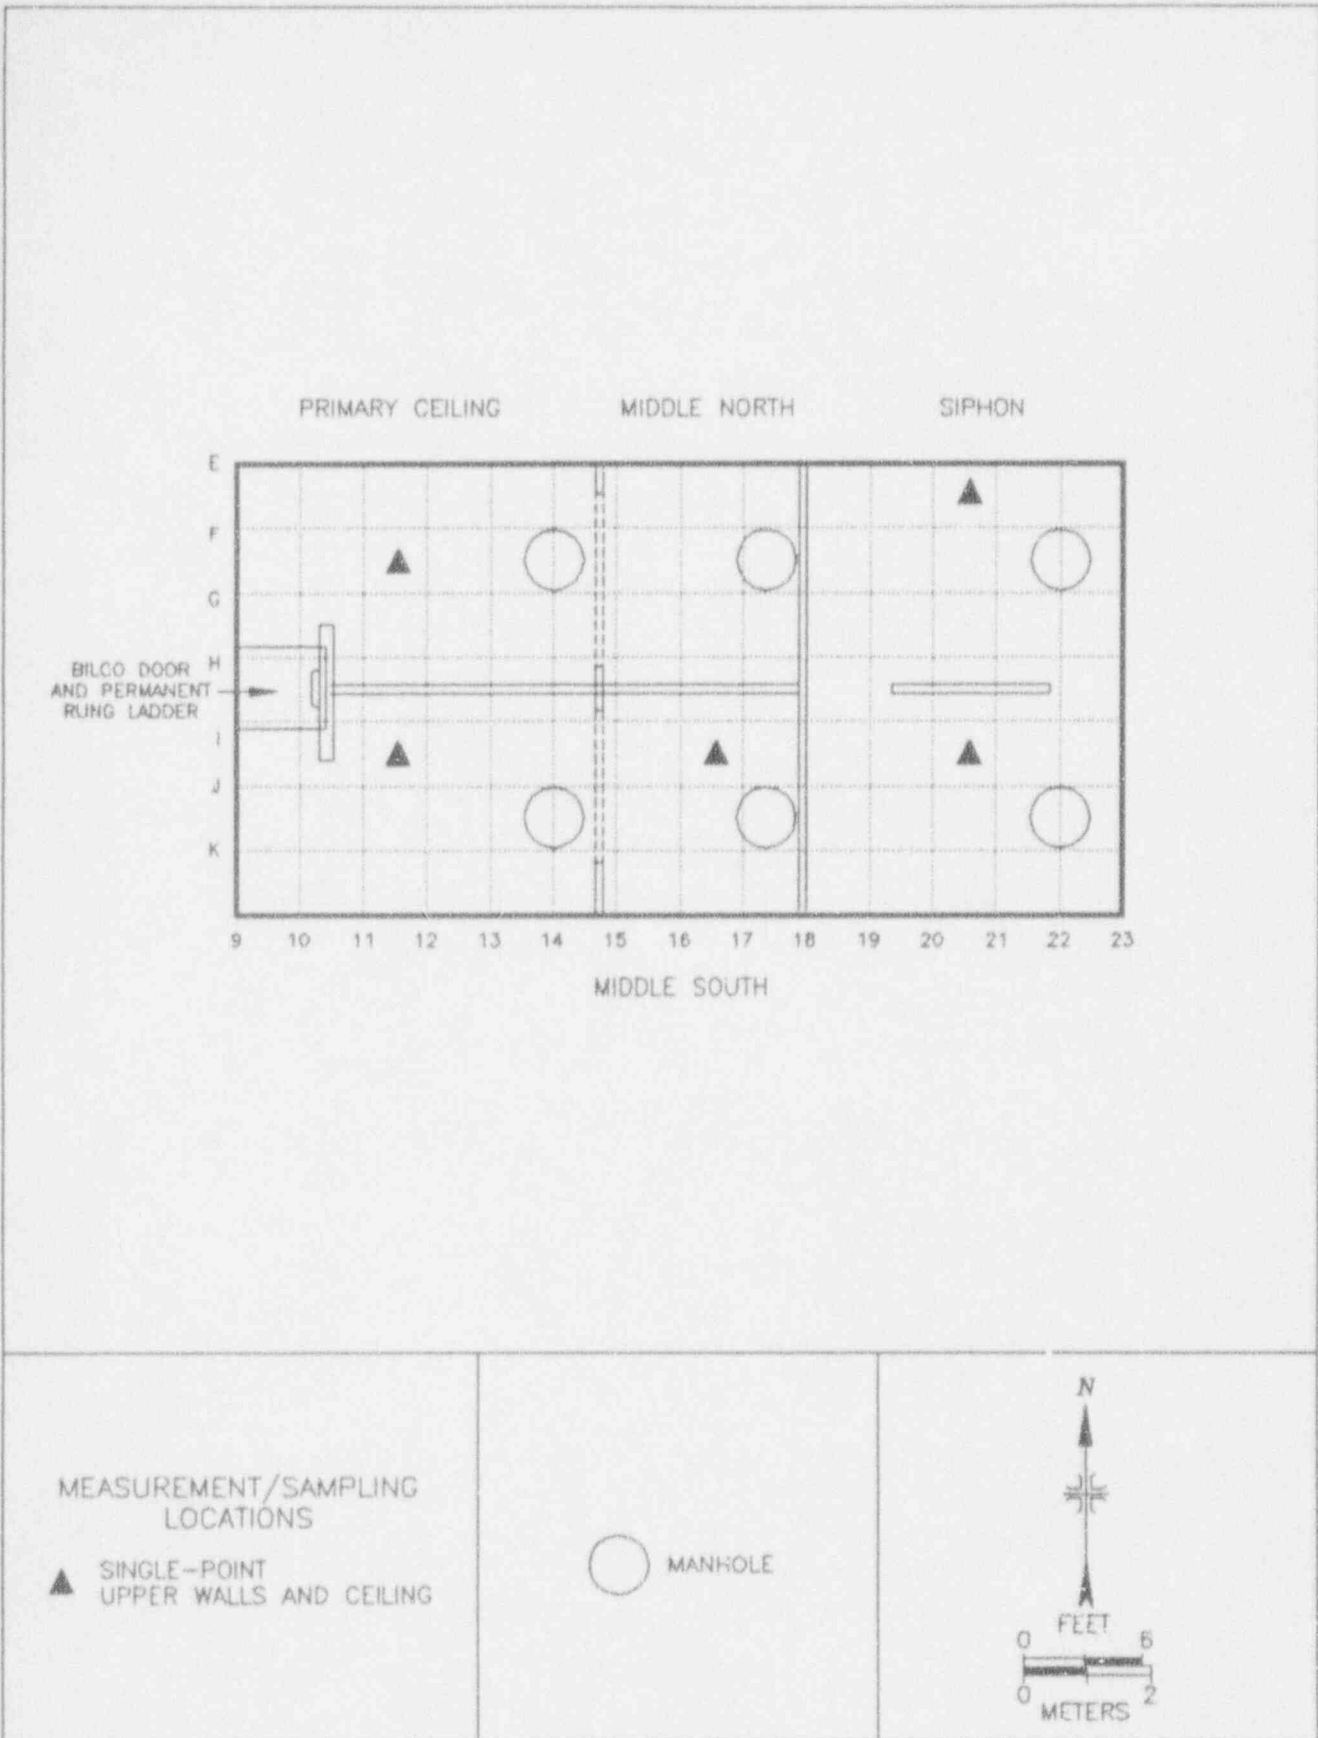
Septic Tank Ceiling – Measurement and Sampling Locations
